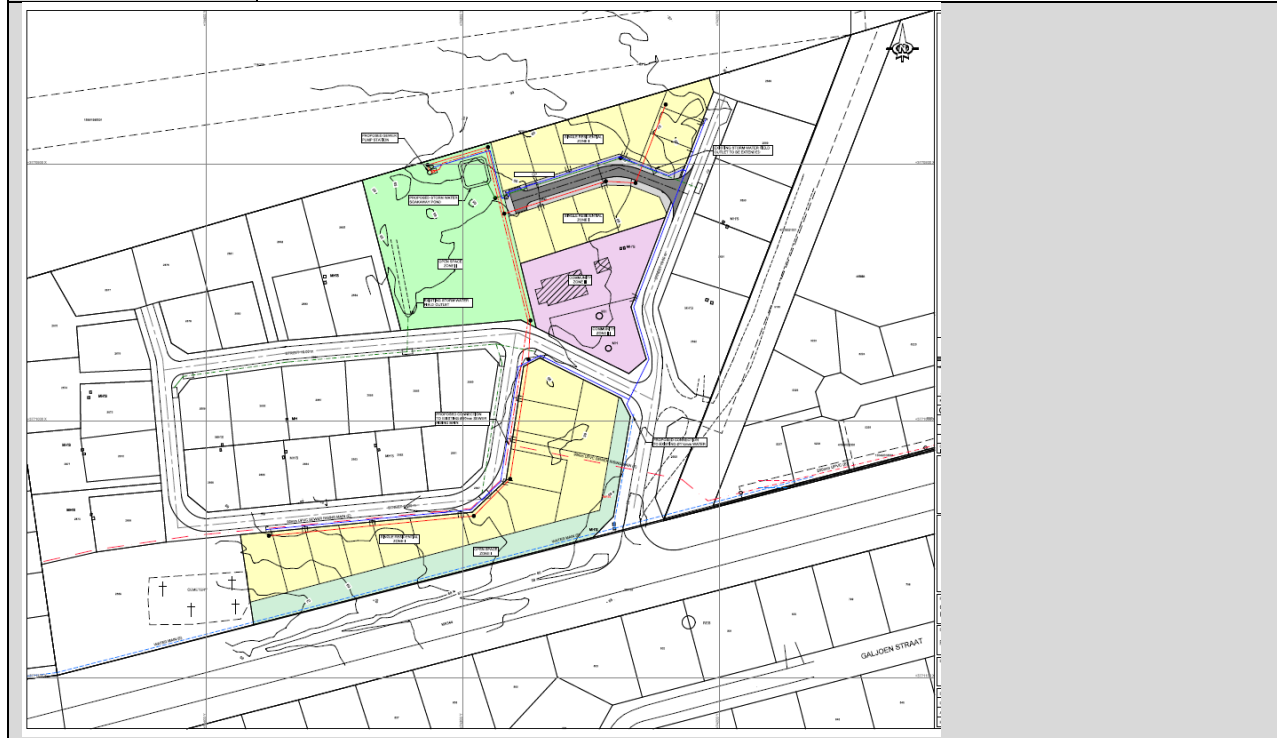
Plan showing the existing services (Marika Vreken Town Planners, 2024)
